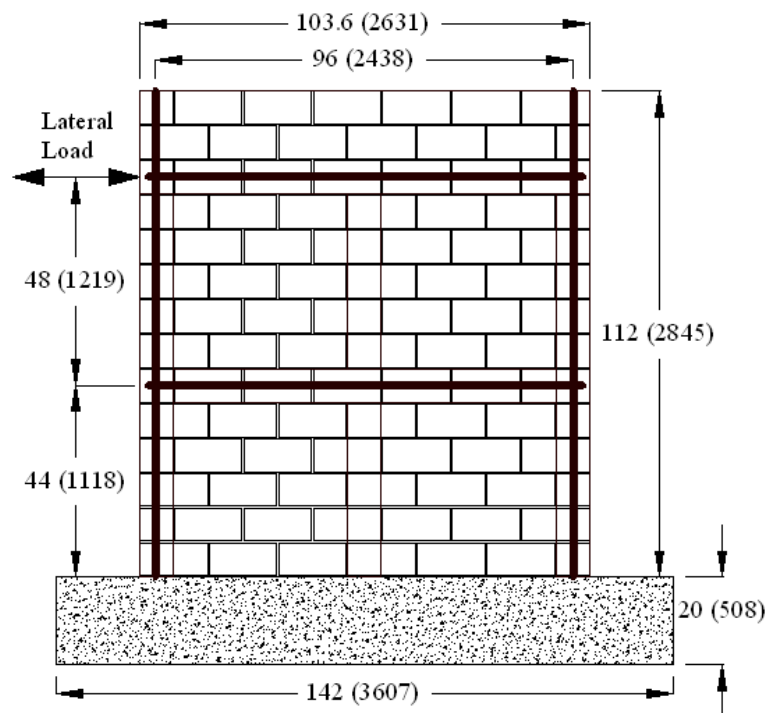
Dimensions common to all wall specimens, given as in. (mm)
